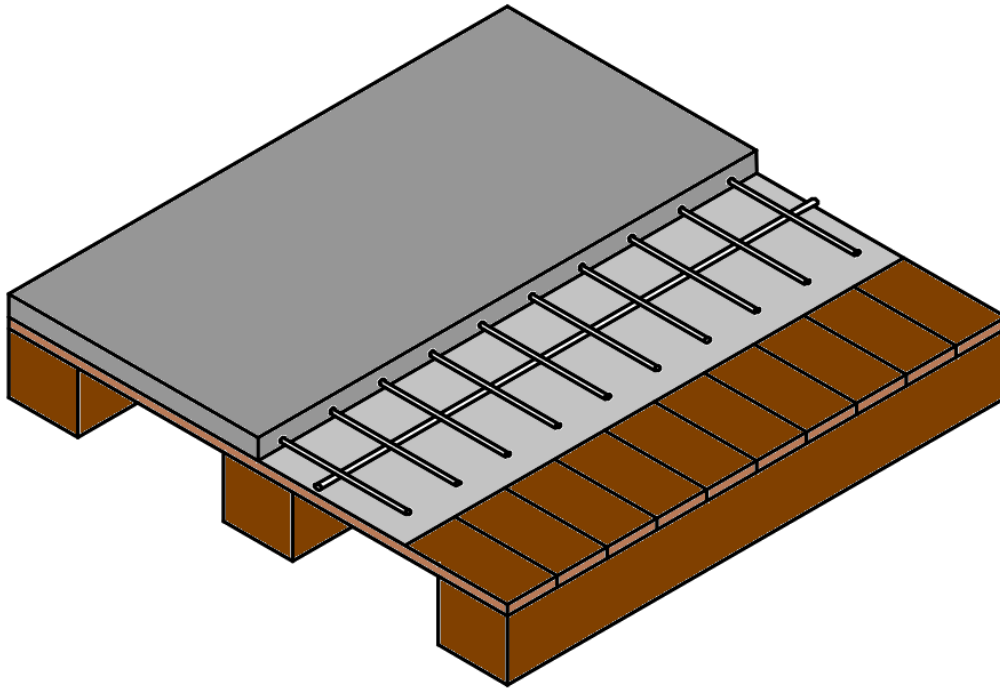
Reinforced timber floor by adding a concrete slab on top of the existing one.
